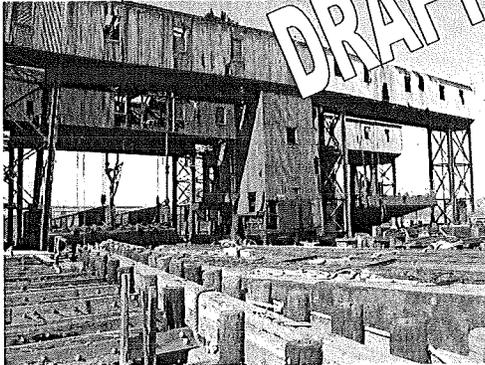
Northeast quadrant of pedestals, pedestal spalling with exposed rebar, looking west.
